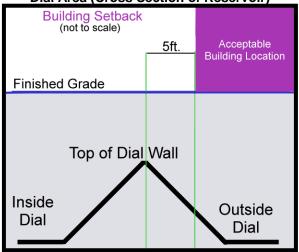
Required Building Setback Near Dial Area (Cross Section of Reservoir)
